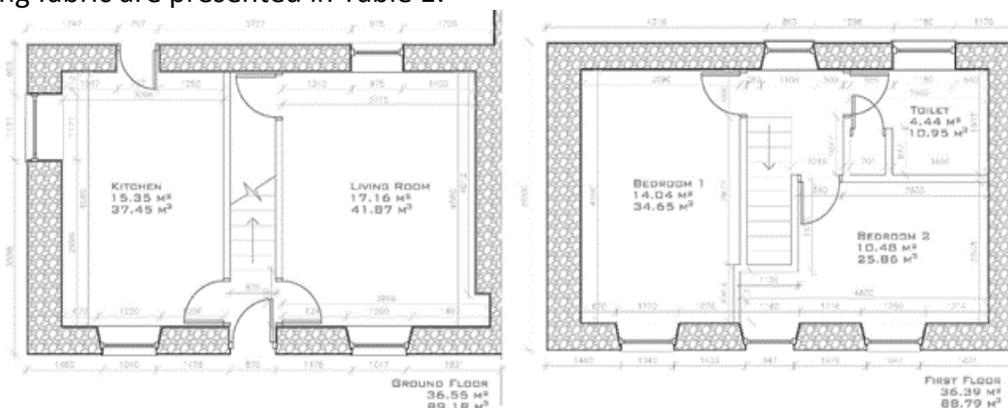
Building's layout (SPECIFIC 2 LCBE Project)
